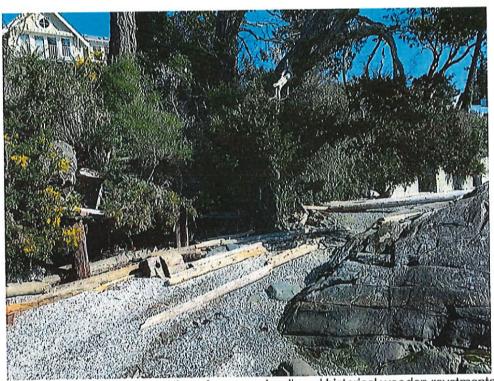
South eastern section of proposed wall, and historical wooden revetments visible.
